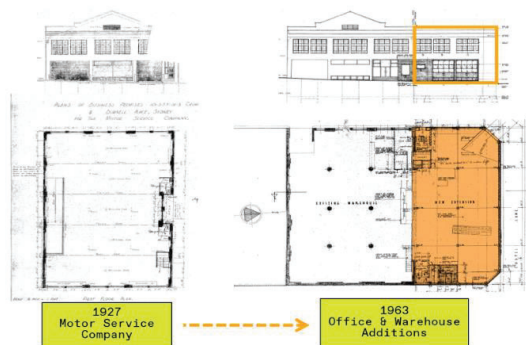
Comparison between 1927 and 1963 plan and eastern façade.
